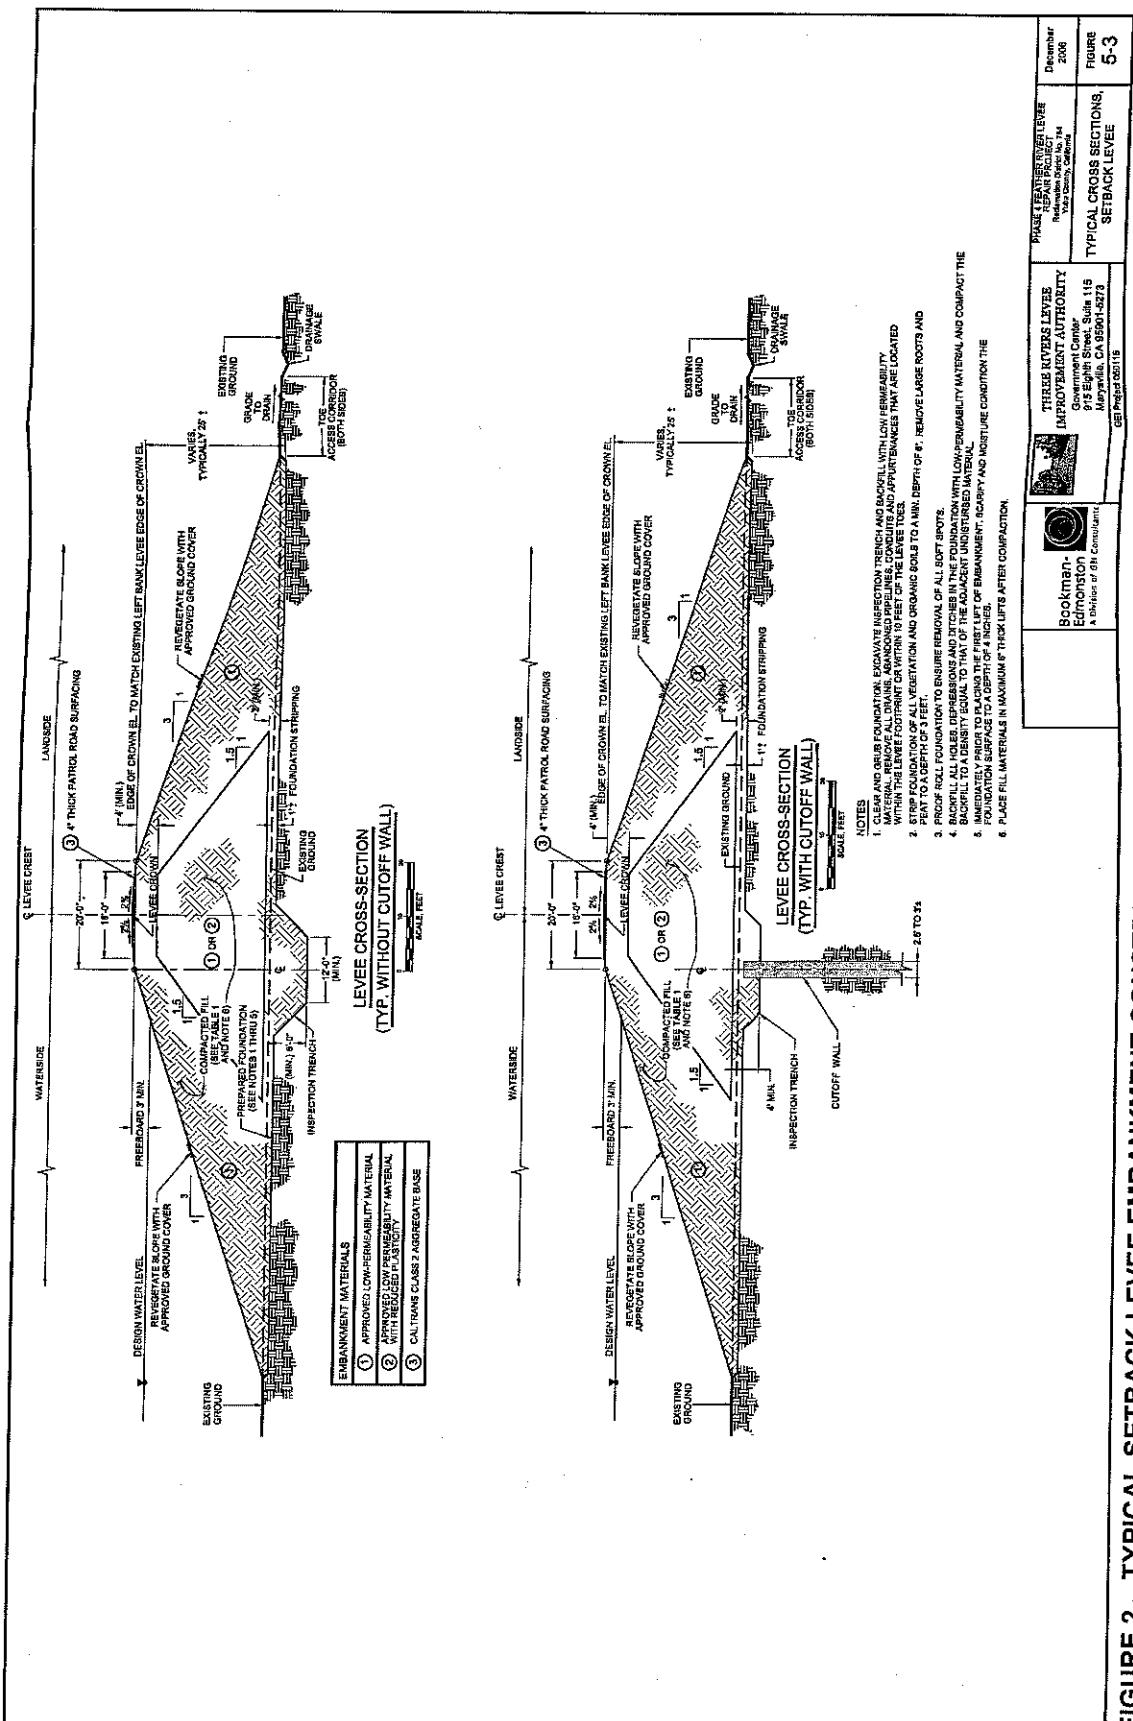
TYPICAL SETBACK LEVEE EMBANKMENT CONSTRUCTION
